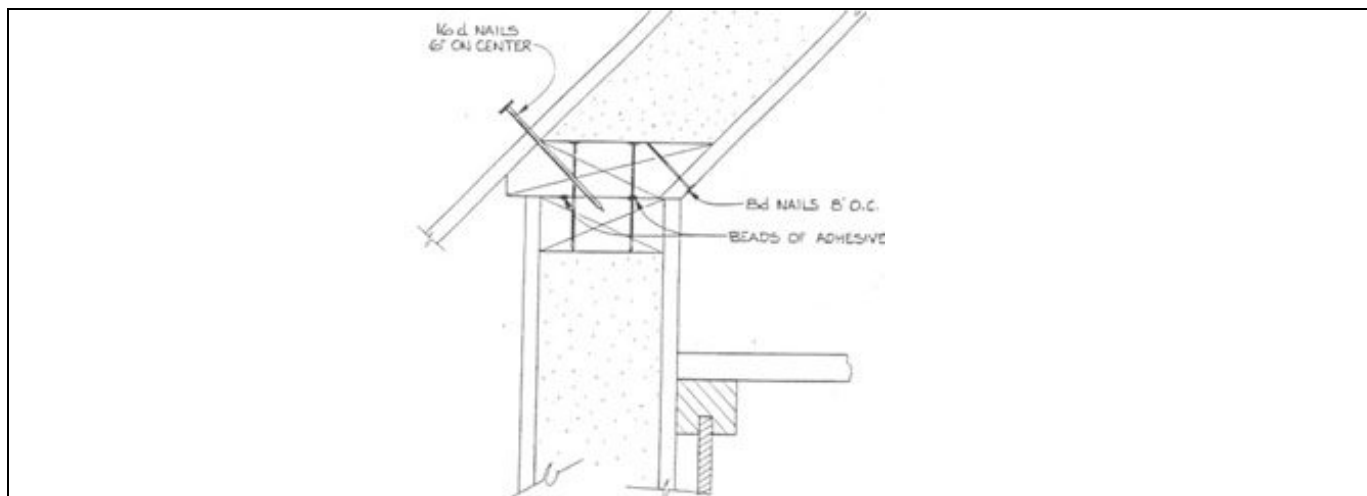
Securing First Roof Panel at Eave: Attachment to already-installed bottom spline in steep roofs (over 12:12) is shown. If there is an attic floor, you may not be able to nail the bottom OSB skin into the spline. For shallow roofs, see Figures 30 and 31.
